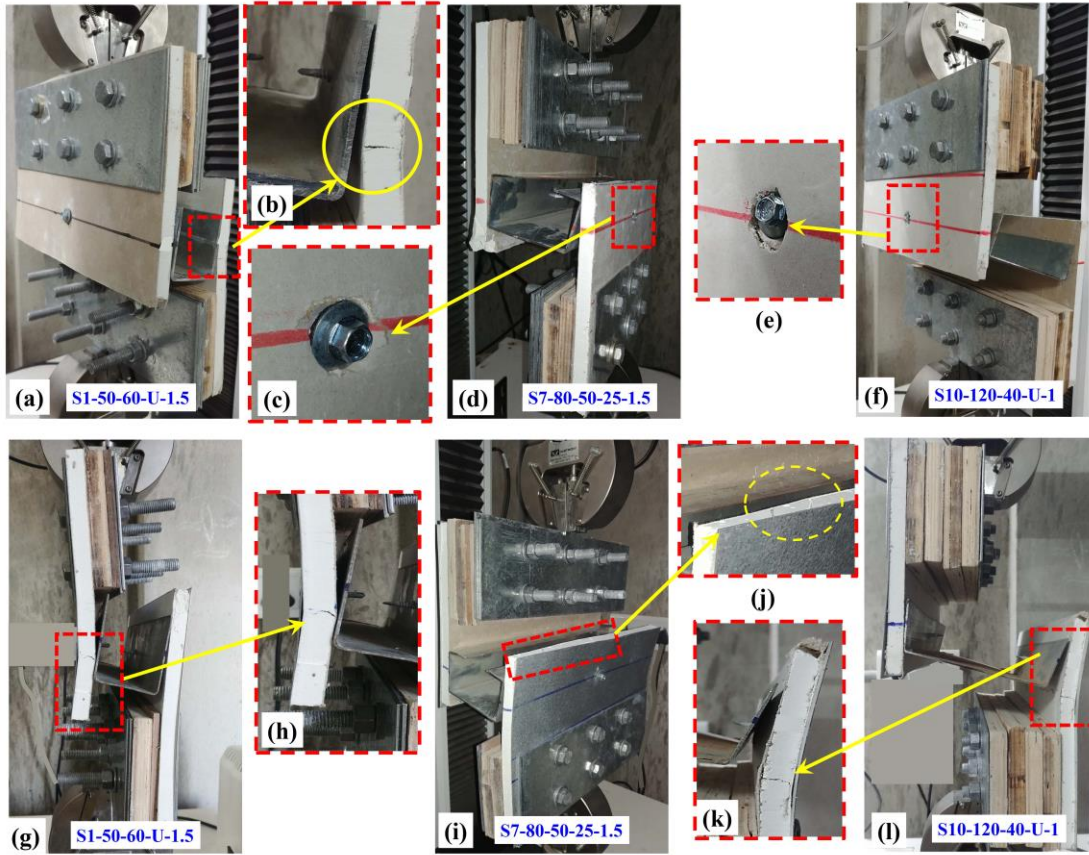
Failure modes of gypsum (12.5 mm) sheathing board against the various CFS studs (shown in ascending order of depth of CFS stud) – failure mode is varying: (a-b) Breakage of FCB sheathing; (c-f) Pull-through of fastener; (g-l) Failure modes of gypsum (12.5 mm) sheathing board + 0.5 mm LGSS external sheet against the various CFS studs (shown in ascending order of depth of CFS stud) – failure mode is constant – Breakage of gypsum board
